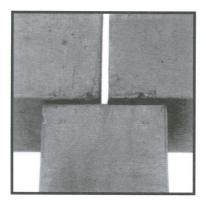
Column/Beam Connection With In-Situ Jointing And Looped Bars
